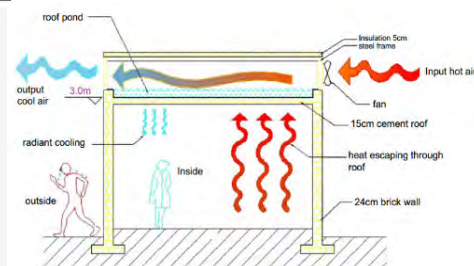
, 14. Detail material for roof pond for the third building (Kruger et al, 2010)
